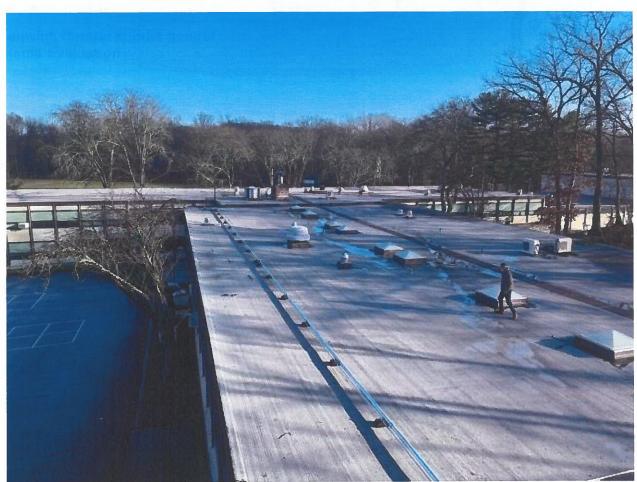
Panoramic view of the roof membrane over the original building. Bird path puddles and blistering are systemic throughout the roof.
